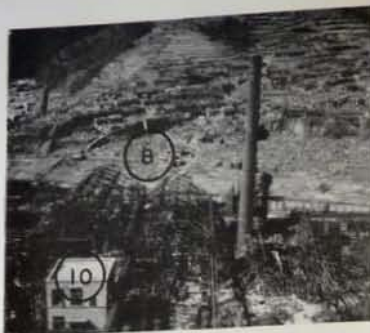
Group 31, Building 1. Aerial view, looking west at Mitsubishi casting plant.
